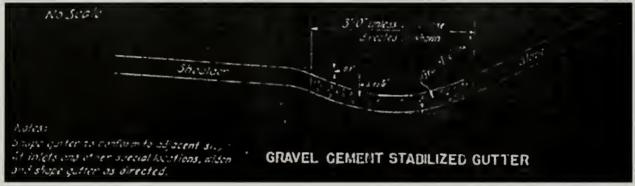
Cross-section of a gravel cement waterway for Day Mountain Road Extension. (U.S. Department of Commerce, Bureau of Public Roads, Project 9A2, Sheet 5 of 11, November 1950)
